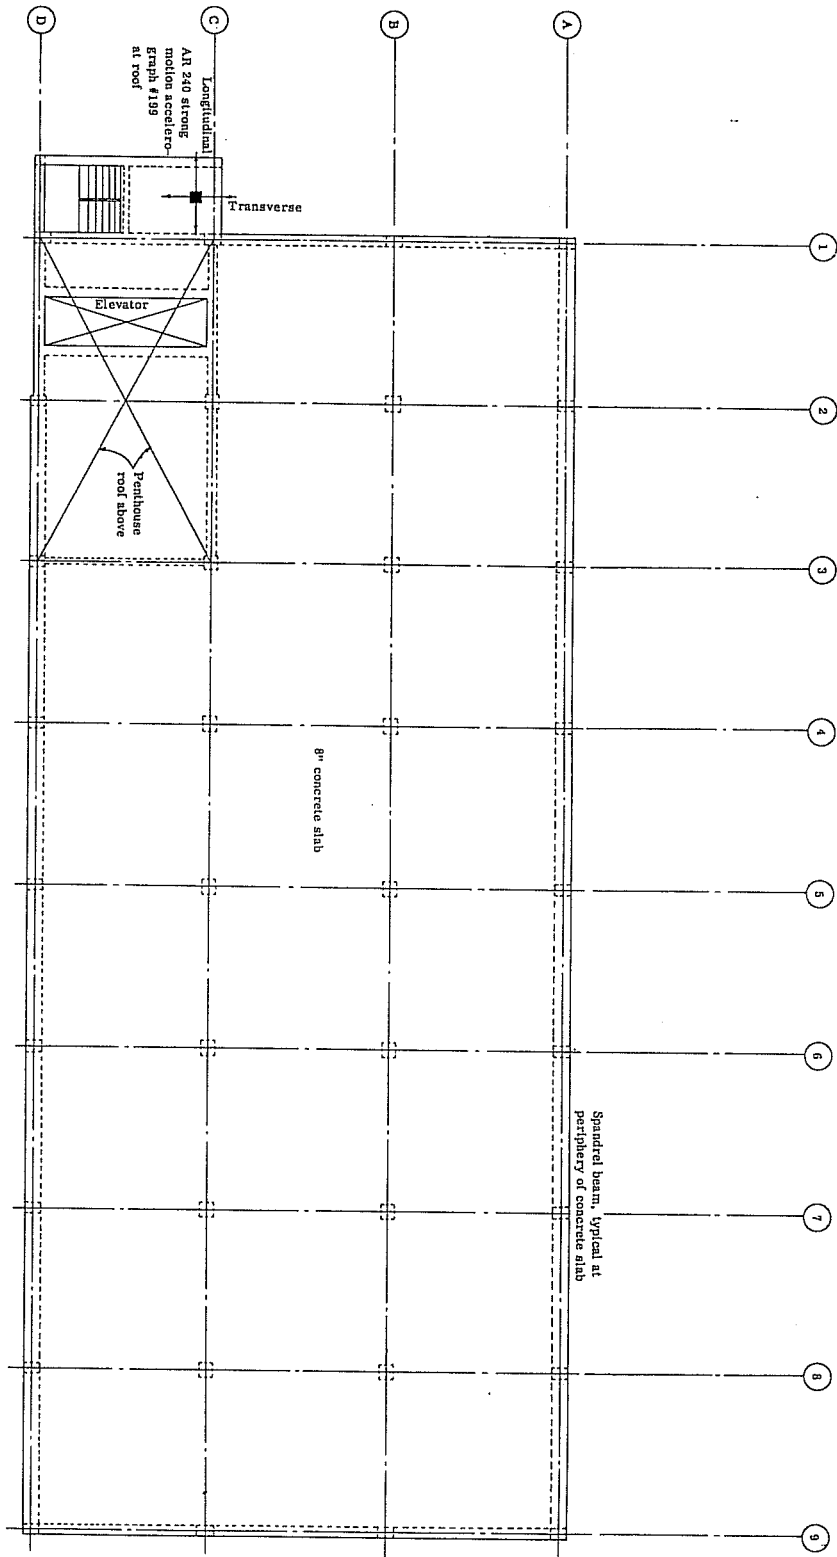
Seven-Story Hotel. Roof Framing Plan⁶⁸
